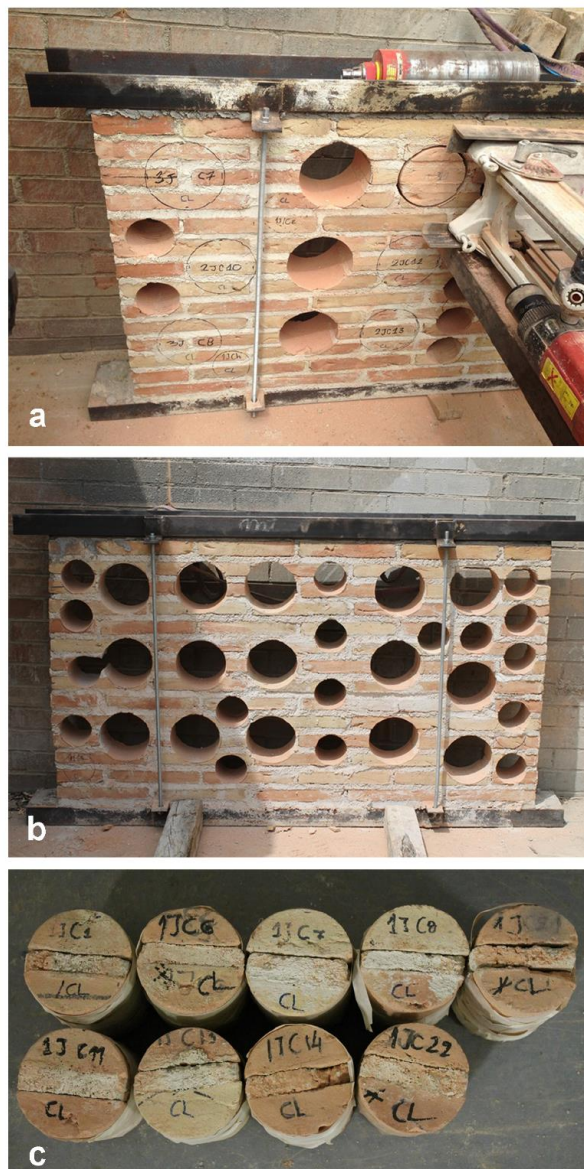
a) *Masonry walls during extraction*, b) *masonry walls after extraction* and c) *samples extracted*.
